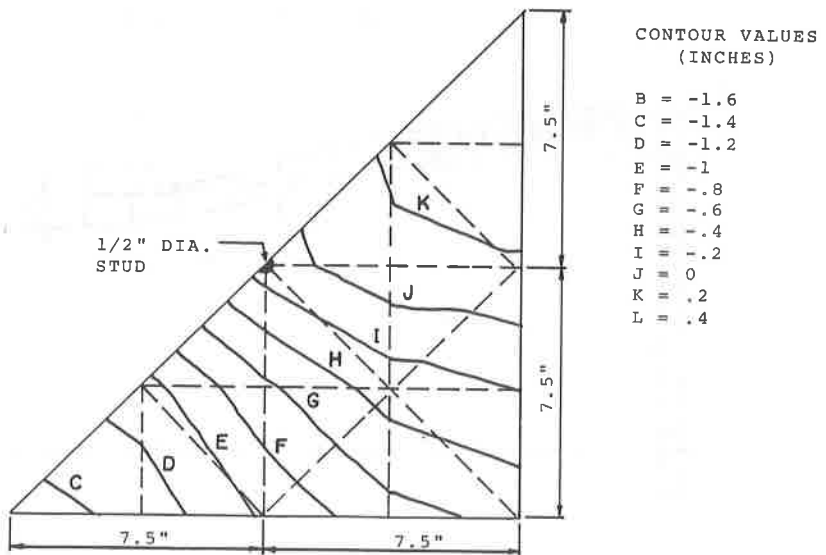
WALL LINER - DIAGONAL CHECKERBOARD BUCKLING
